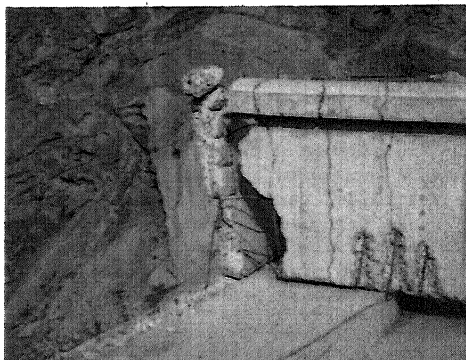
Sefid-rud dam. Failure in the parapet wall of the north side.
